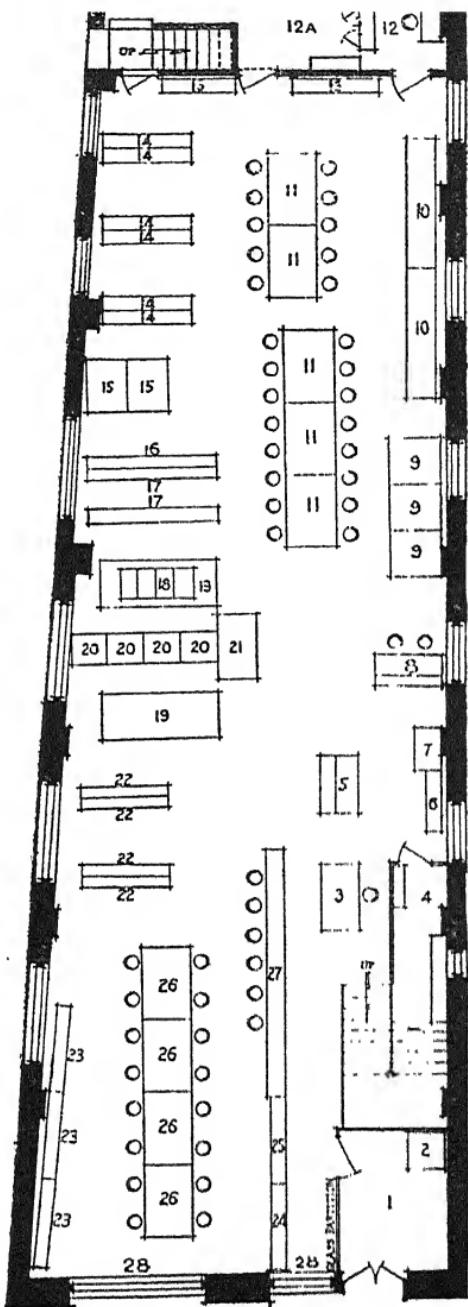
Key to floor plan on opposite page. Business Branch. Dimensions of room, 26' x 90'.
